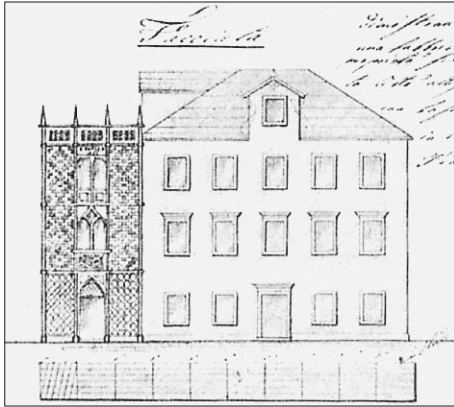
JOSIP SLADE: PLANS FOR THE EXTENSION OF PUOVIĆ HOUSE FROM THE YEAR 1860
